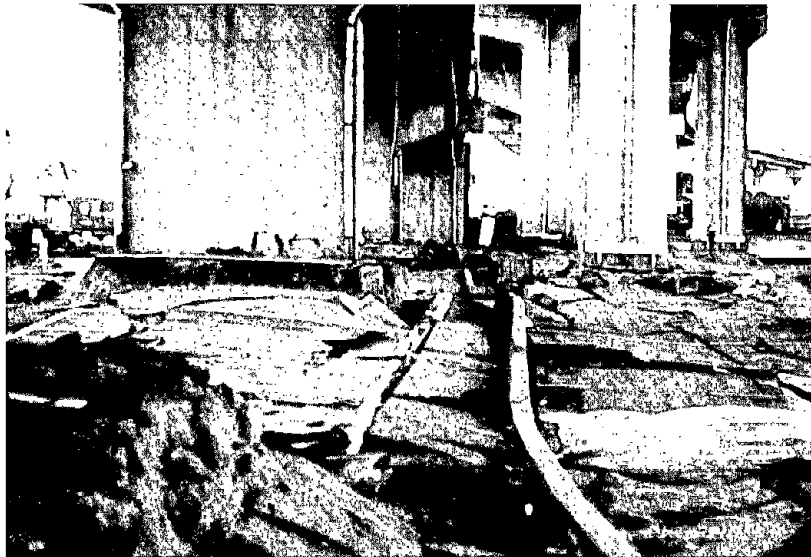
East bank of Maya-ohashi bridge: beneath elevated roadway.
